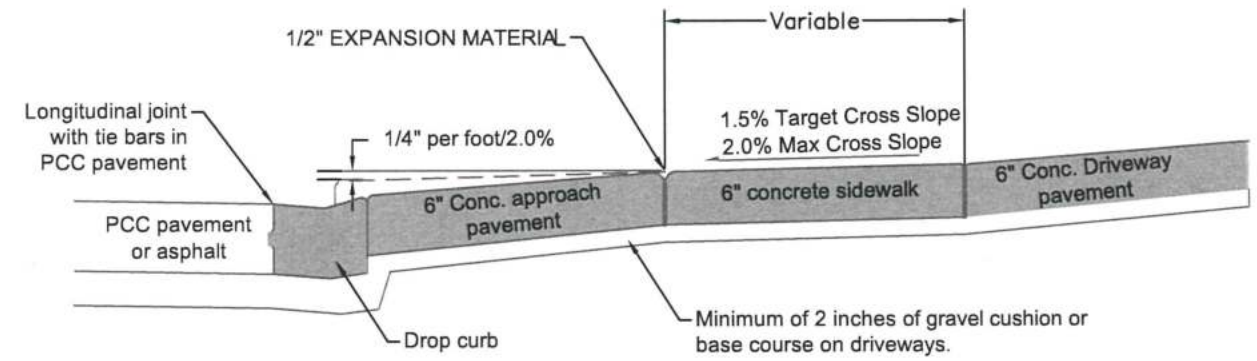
DETAIL FOR CONCRETE FLARES AND TAPERED CURB AT DRIVEWAYS
